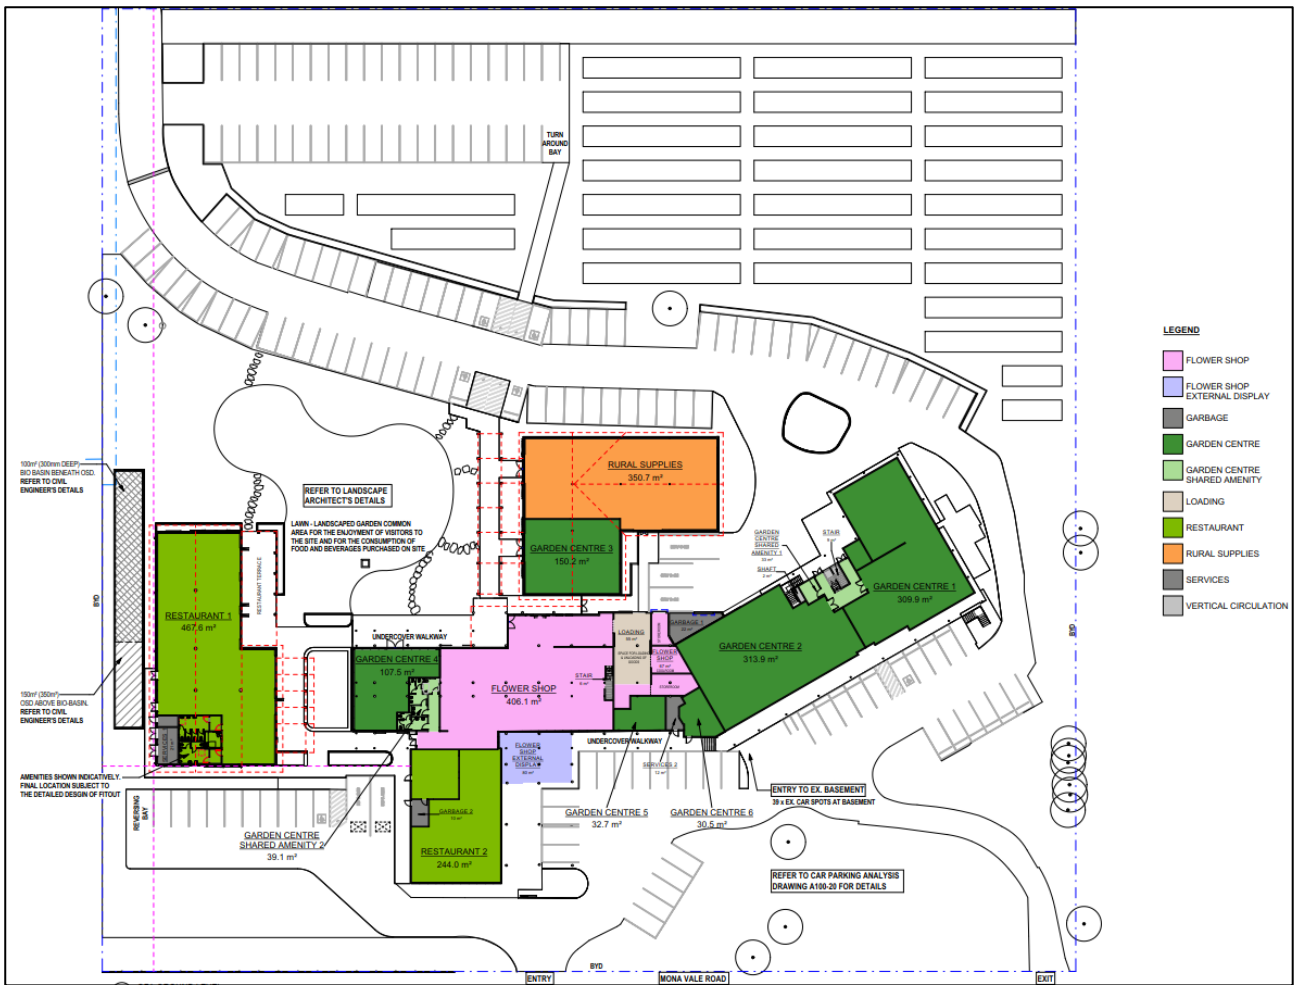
Proposed Ground and Mezzanine Floor Plans (Source: BN Architecture)
